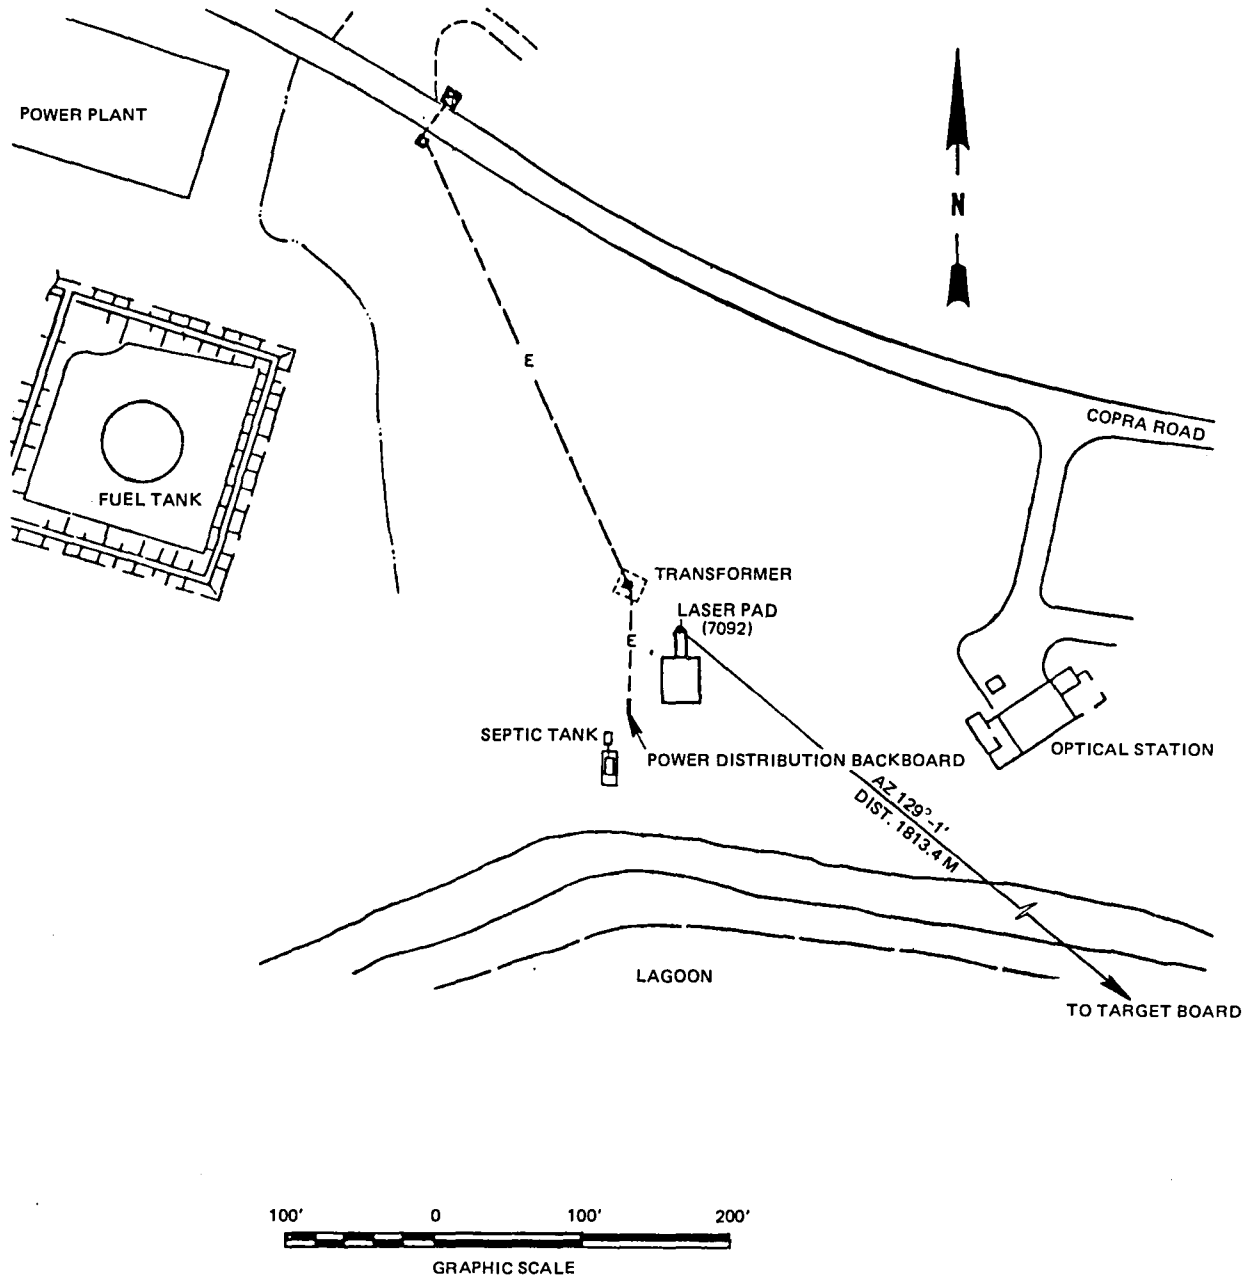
KWAJLN. KWAJALEIN Site Sketch
